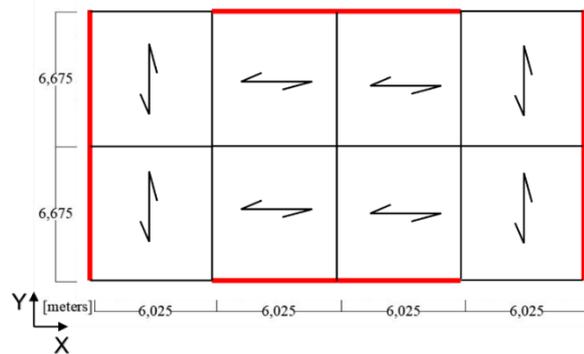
Plan view of the DREAMERS building; MRFs are highlighted in red
